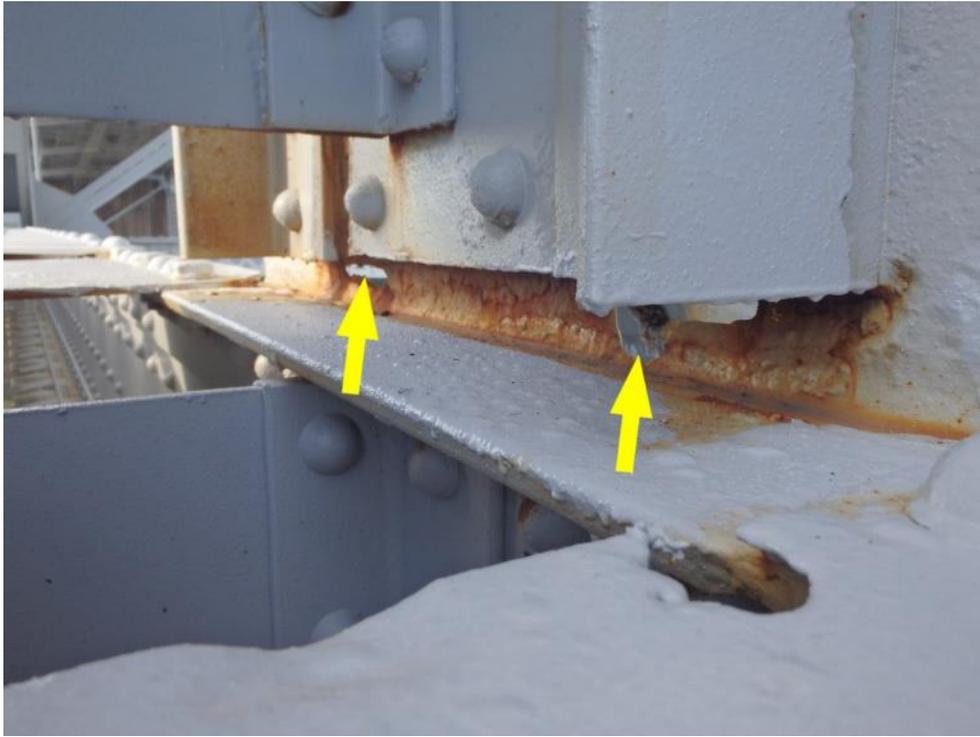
Sagamore Bridge, advanced deterioration to the west gusset plate at truss joint L7 of the east truss in span 3.
